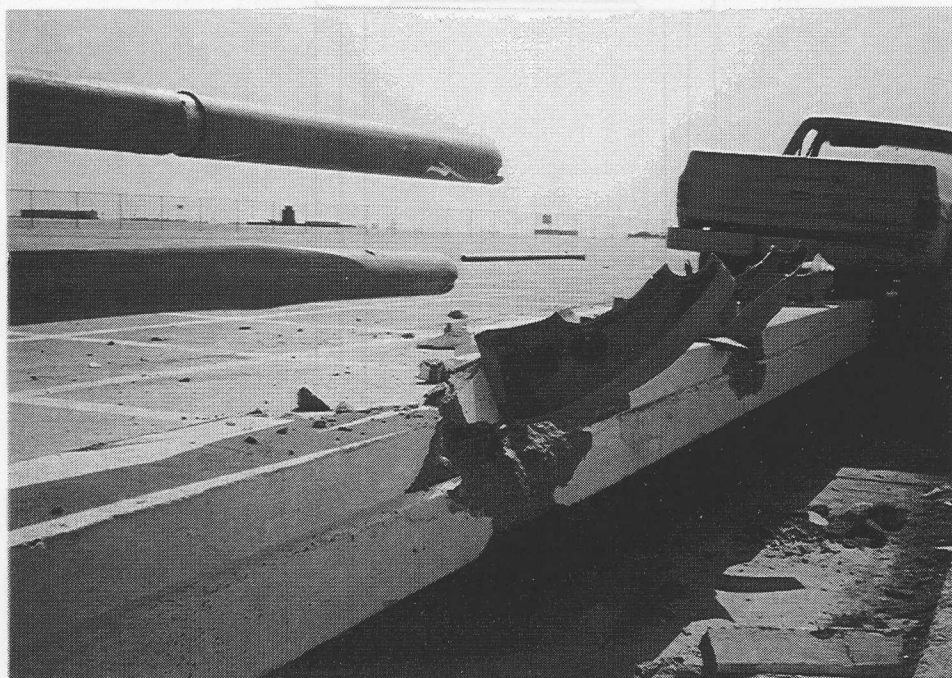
Bridge Rail Damage, Test FPAR-2
